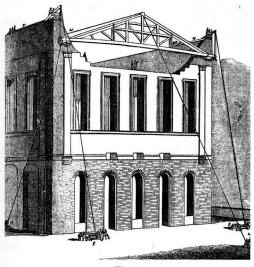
A truss being winched up to the Town Hall's wall heads, Architectural Magazine (1835). Courtesy, Birmingham Central Library
